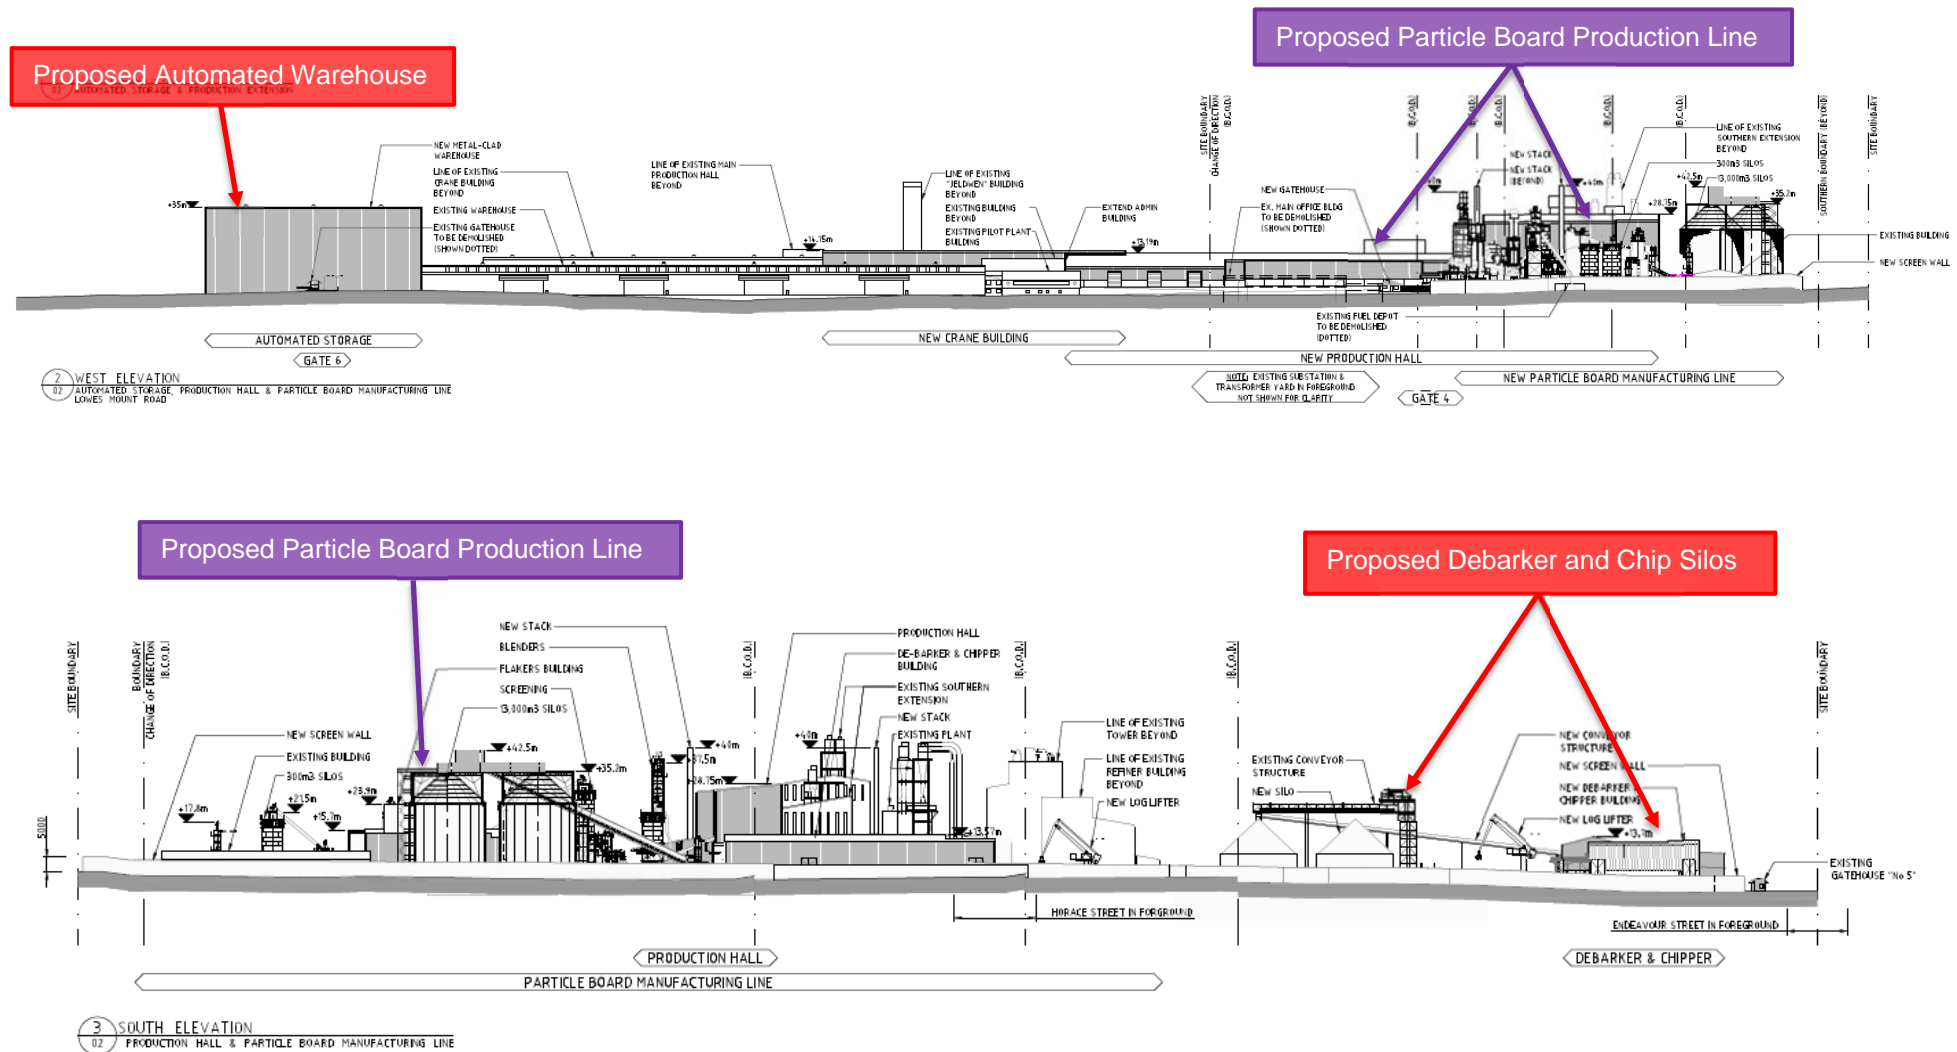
Site Elevation of the Existing and Proposed Development (West and South Elevation)
